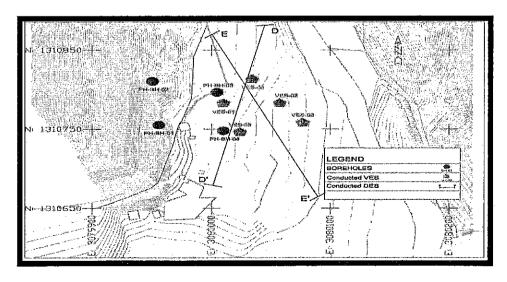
Location of Boreholes, DES & ERS at Powerhouse Site
